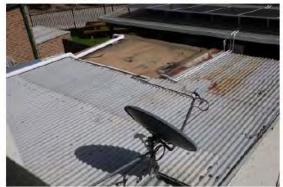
| View of roof to NW wing lean-tos. To be removed.
